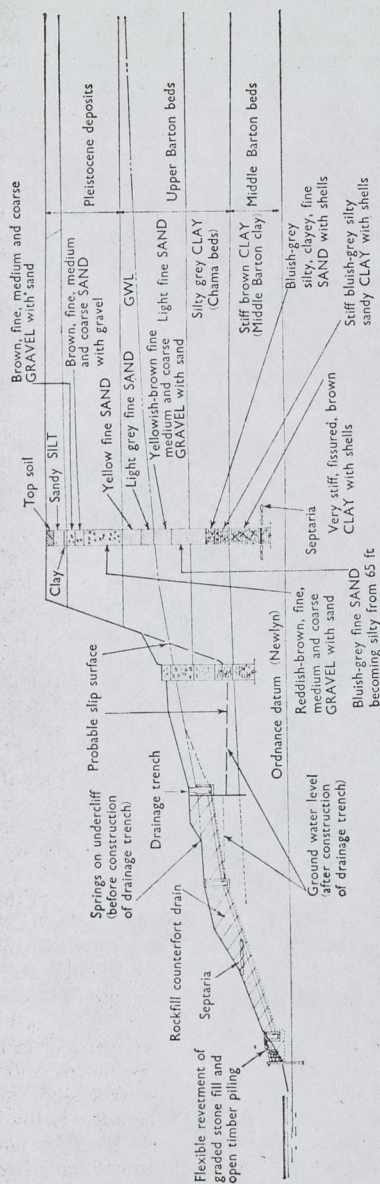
Typical cross section at Barton-on-Sea undercliff indicating surfaces of sliding and remedial work
